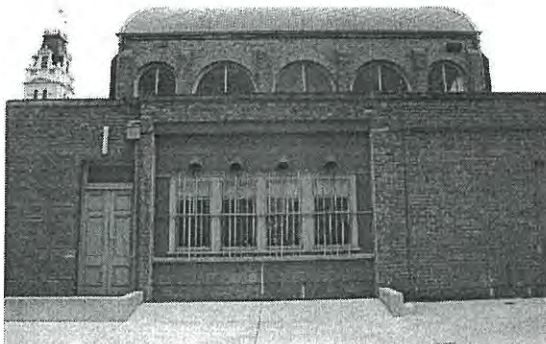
Exterior, Exchange Hall, detail of introduced bank of timber framed double hung windows and sheet wall cladding in east elevation.
